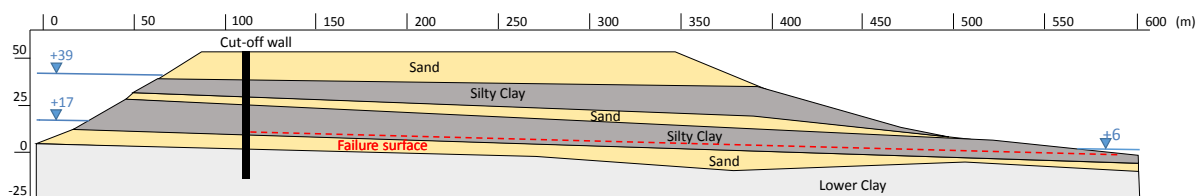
Section of the North Spur and location of the assumed failure plane
